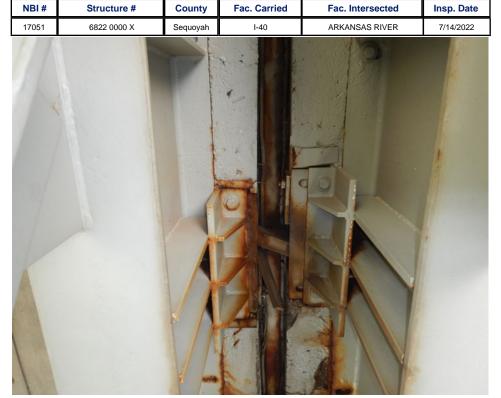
Looking north at support assembly 10 at the pier 6 modular joint. Note: no change to the one dislodged control bar.
